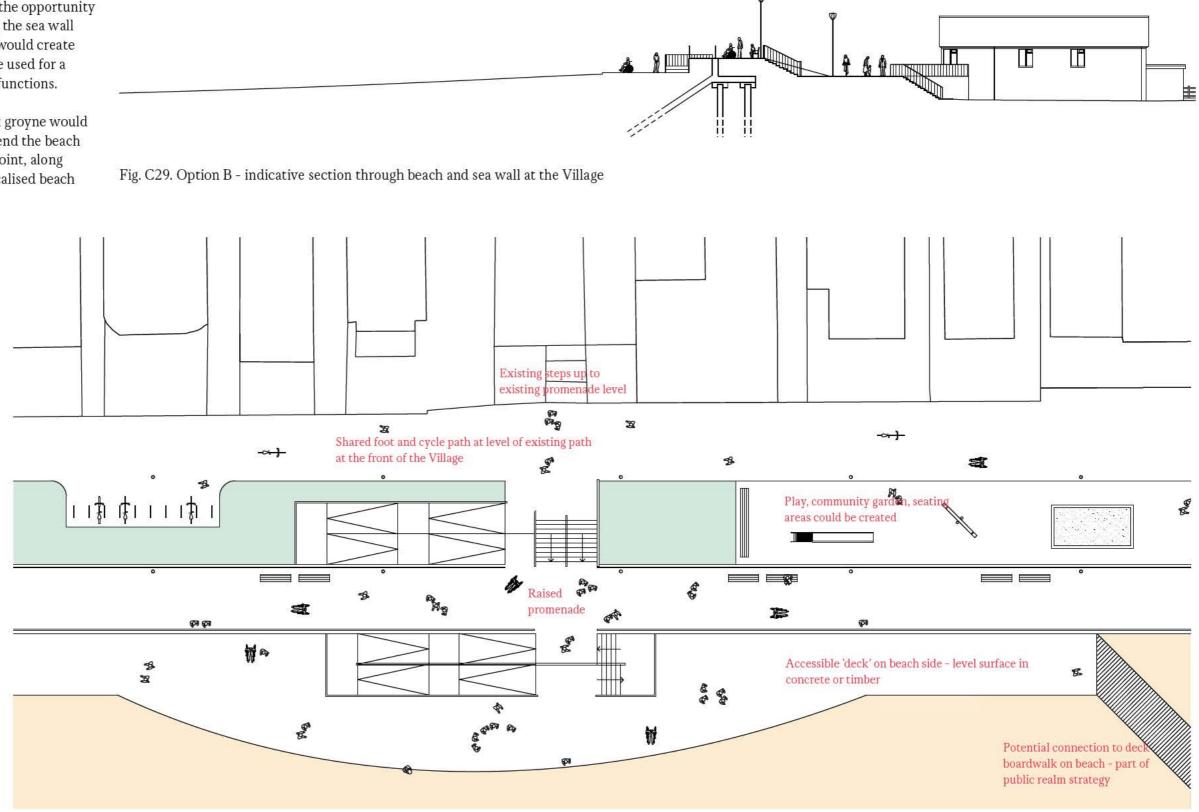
Option B - indicative plan of proposed new sea wall at the Village
